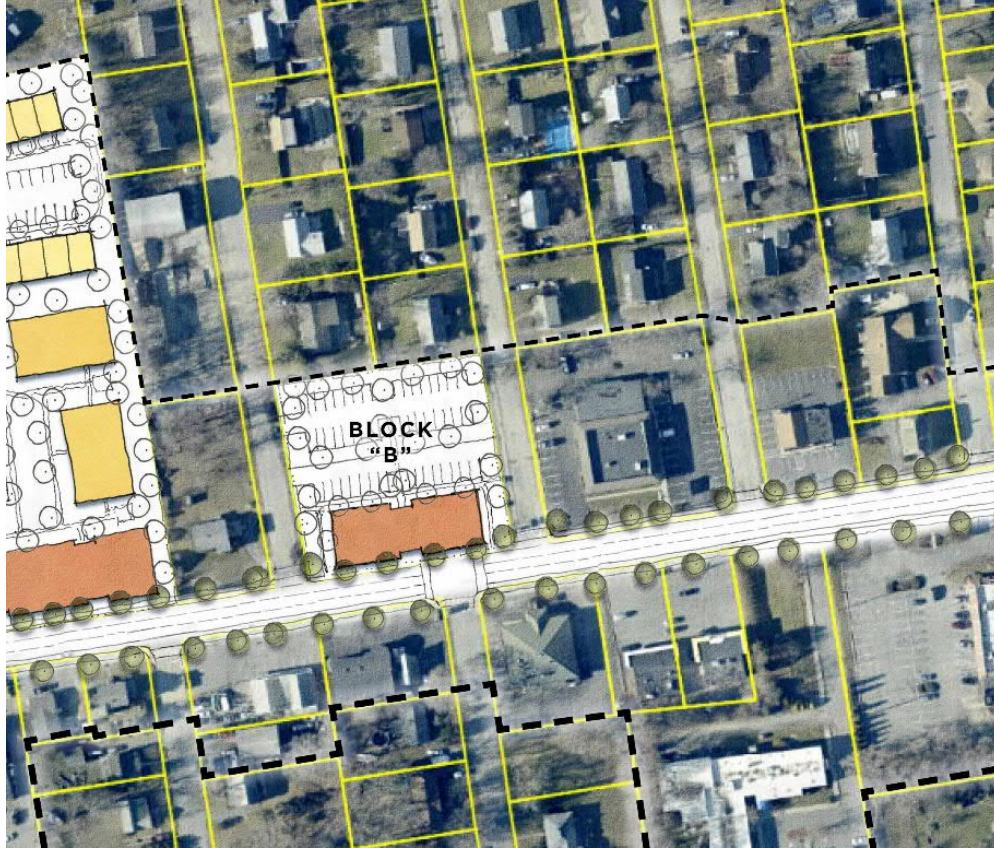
Ridgeway & Canario (Block B) Concept Plan
